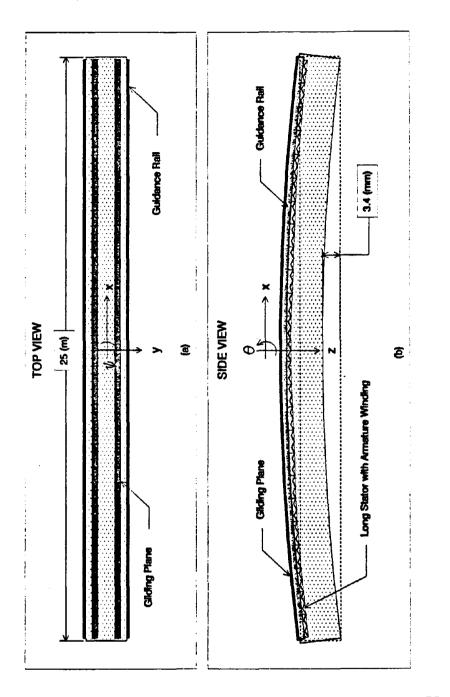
LENGTHWISE VIEW OF SINGLE SPAN GUIDEWAY GIRDER WITH FUNCTIONAL COMPONENTS: (A) TOP SURFACE OF GUIDEWAY, AND (B) VERTICAL CAMBER
